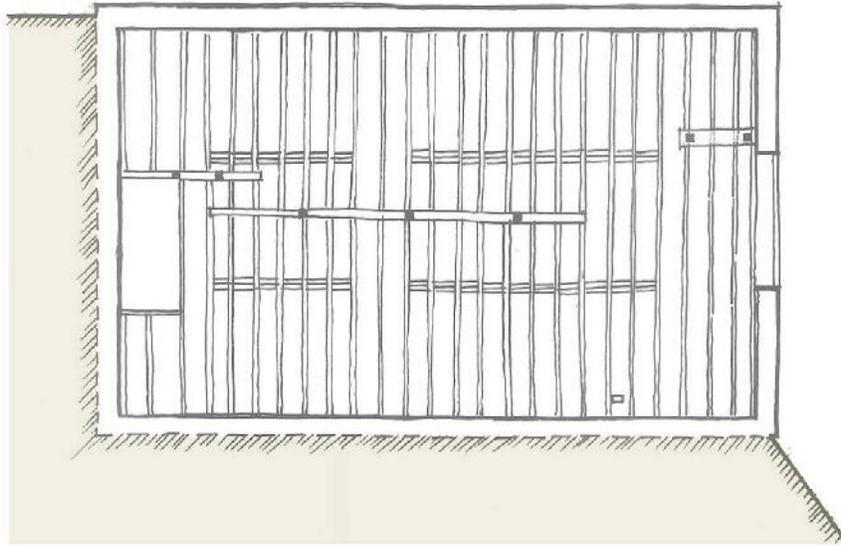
Sketch ceiling plan showing floor joist layout of first floor .
